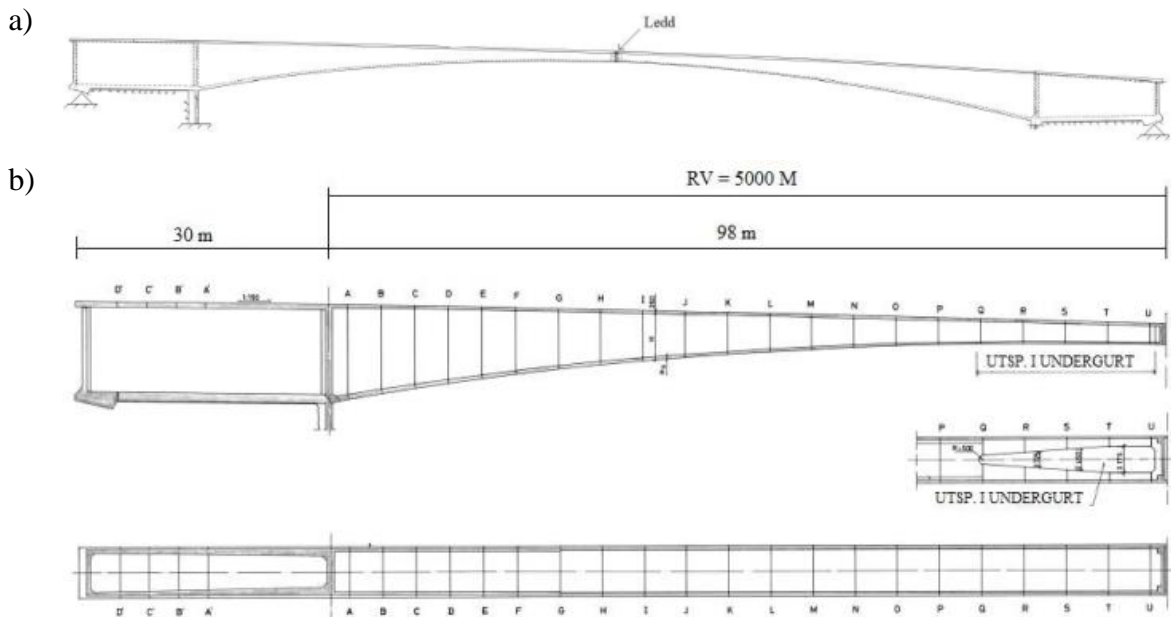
Osstrupen bridge; a) overview and static system; b) drawings of one cantilever half of the bridge
